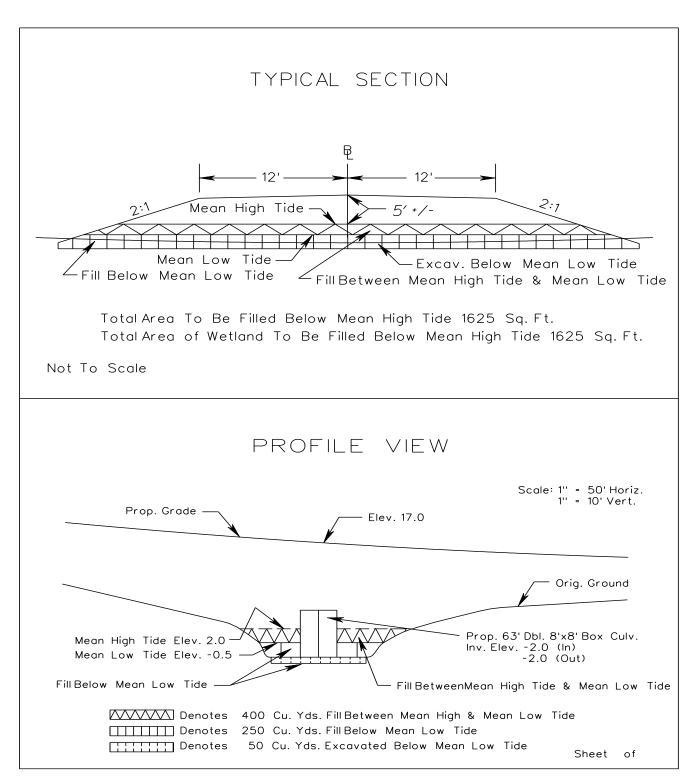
CULVERT (TIDAL) – TYPICAL SECTION AND PROFILE VIEW
